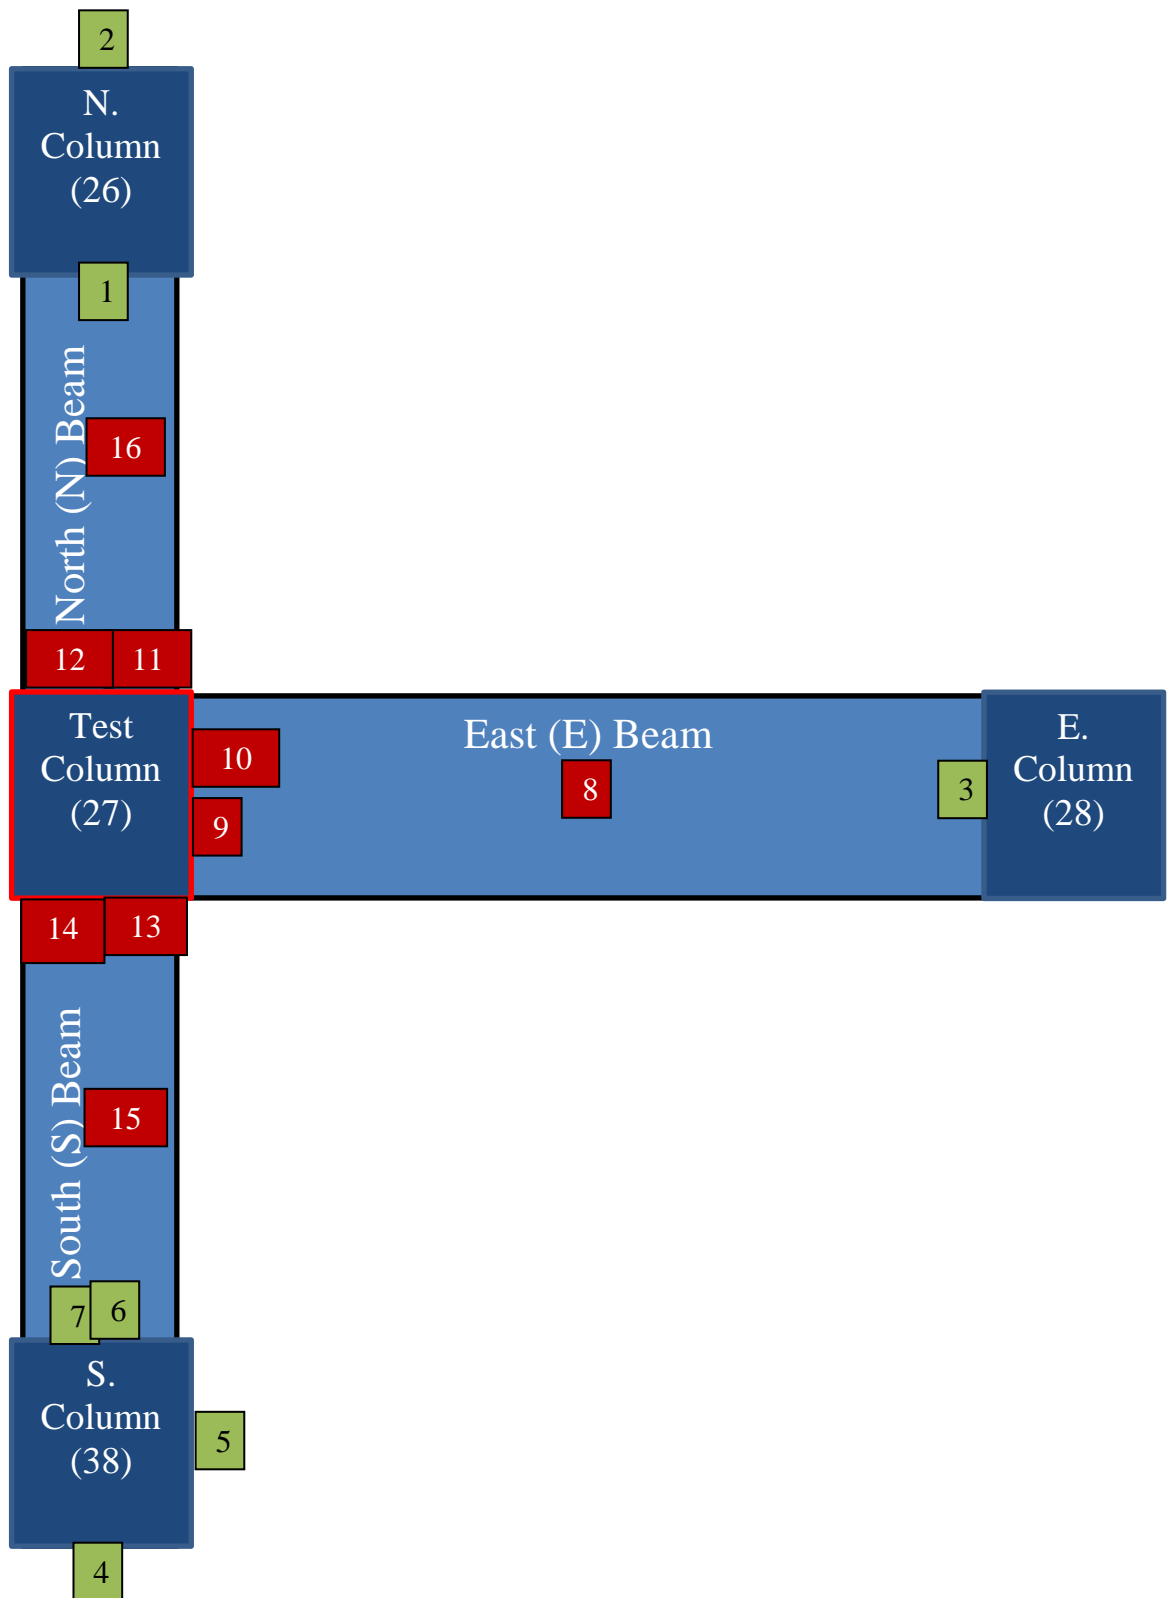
Strain gauge layout on beams (red) and columns (green)
